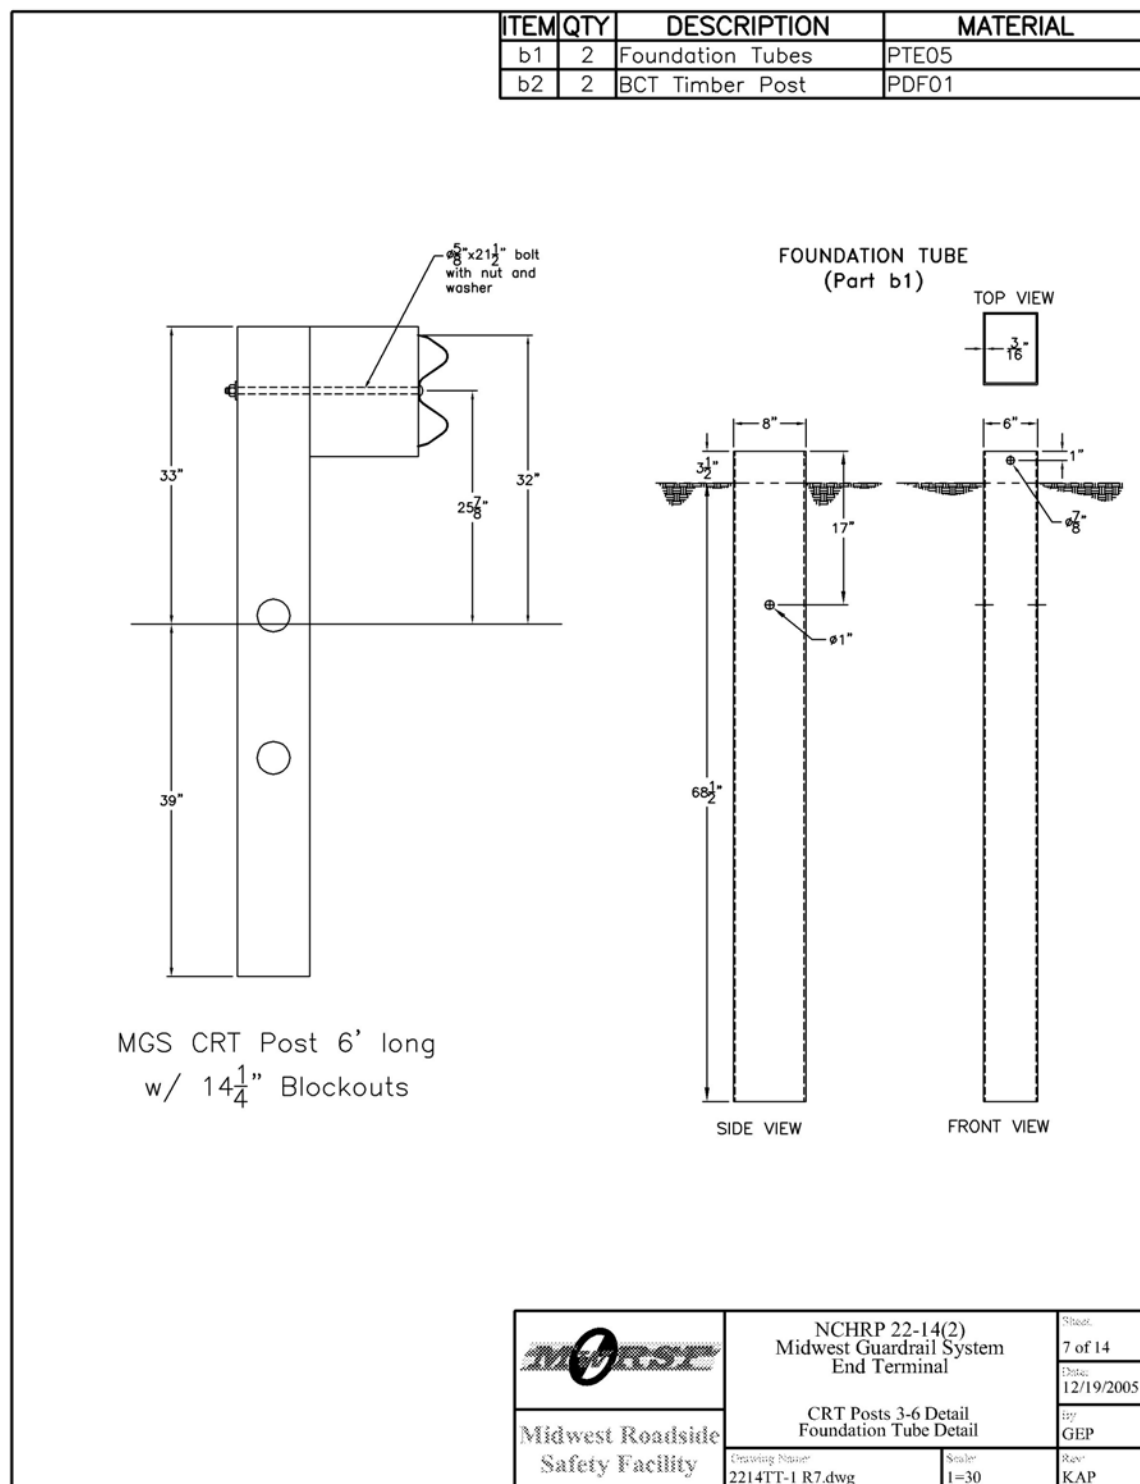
Midwest Guardrail System End Terminal - Post Details (English)
